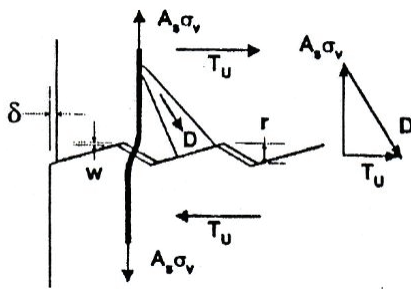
Cracks in reinforced concrete elements due to shear, after [19]
